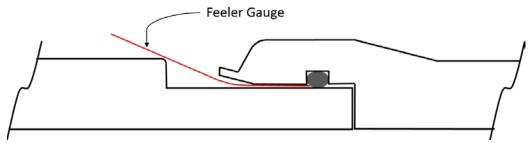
Bell groove with feeler gauge used to locate O-ring gasket
